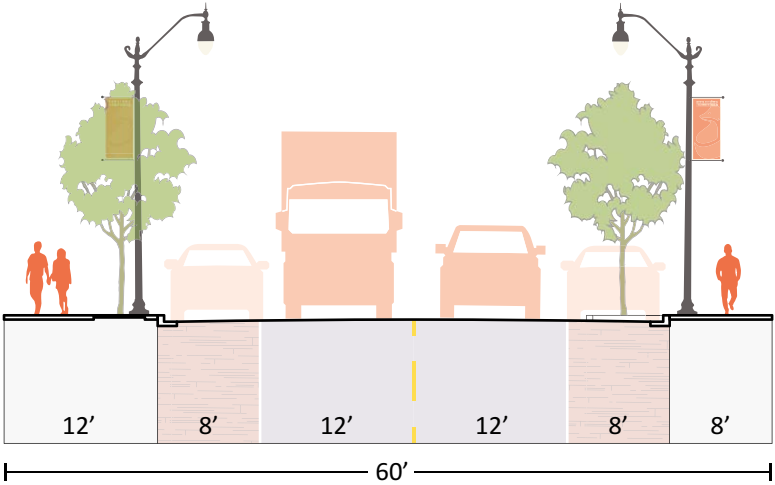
C (1). Van Emmon Street (Long-term).
